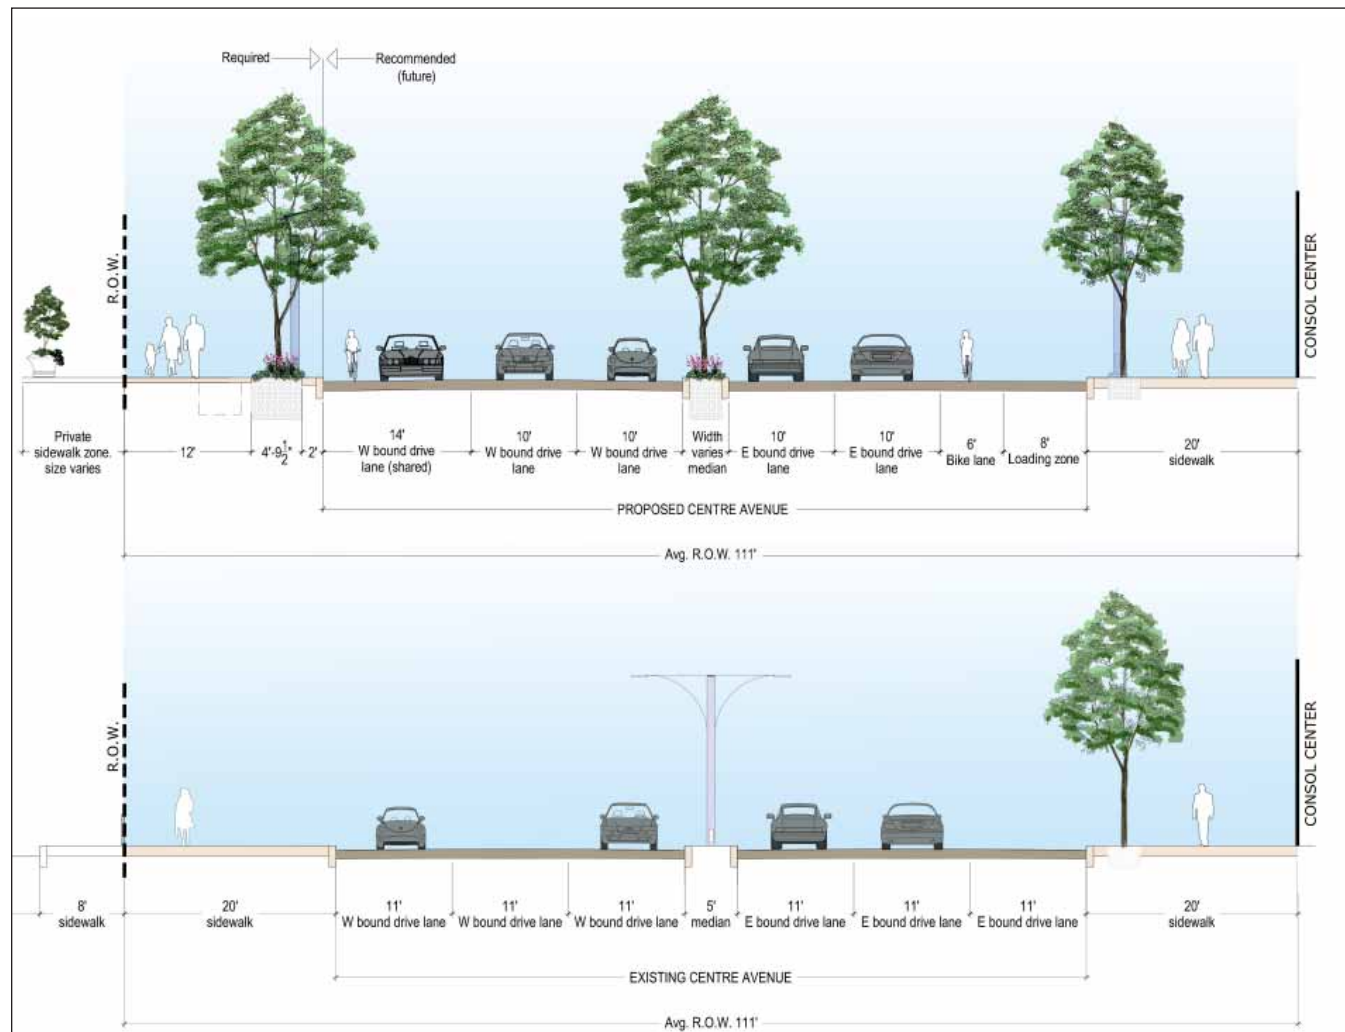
Centre Avenue Section F-F' (approaching Washington Place)
